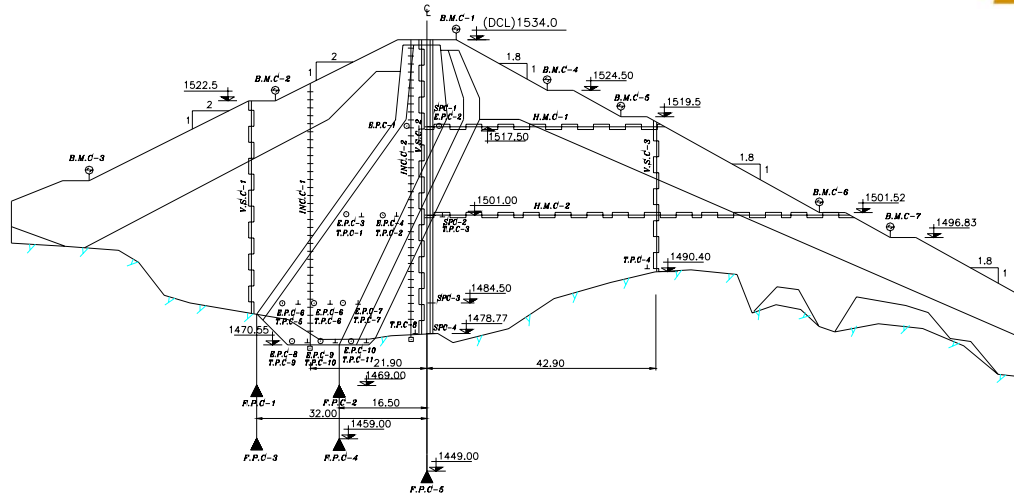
Instrumented cross- section (Section F-F) of Bidvaz dam
